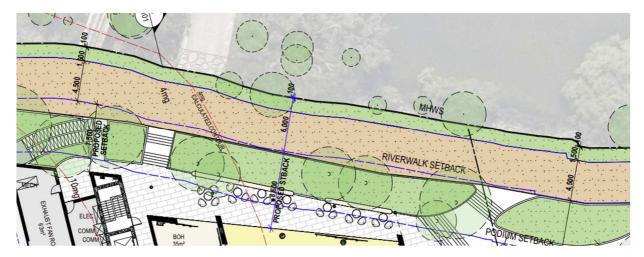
snippet of reissued architectural plan, Sheet SD2002, issue 2, BCC RFI, 22.11.2023
